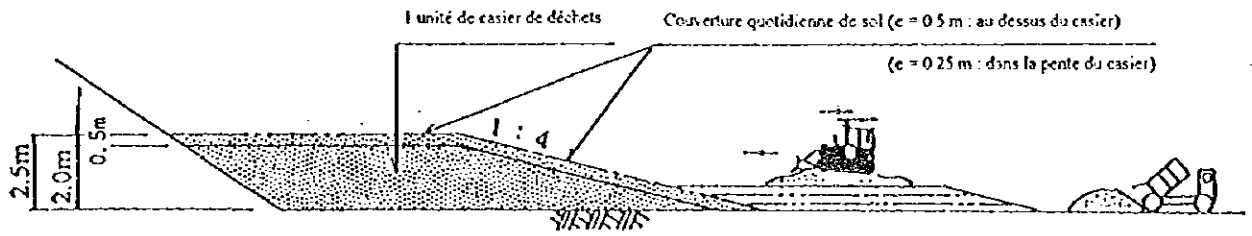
Typical Facilities of Bettioua Disposal Site (3/3)
